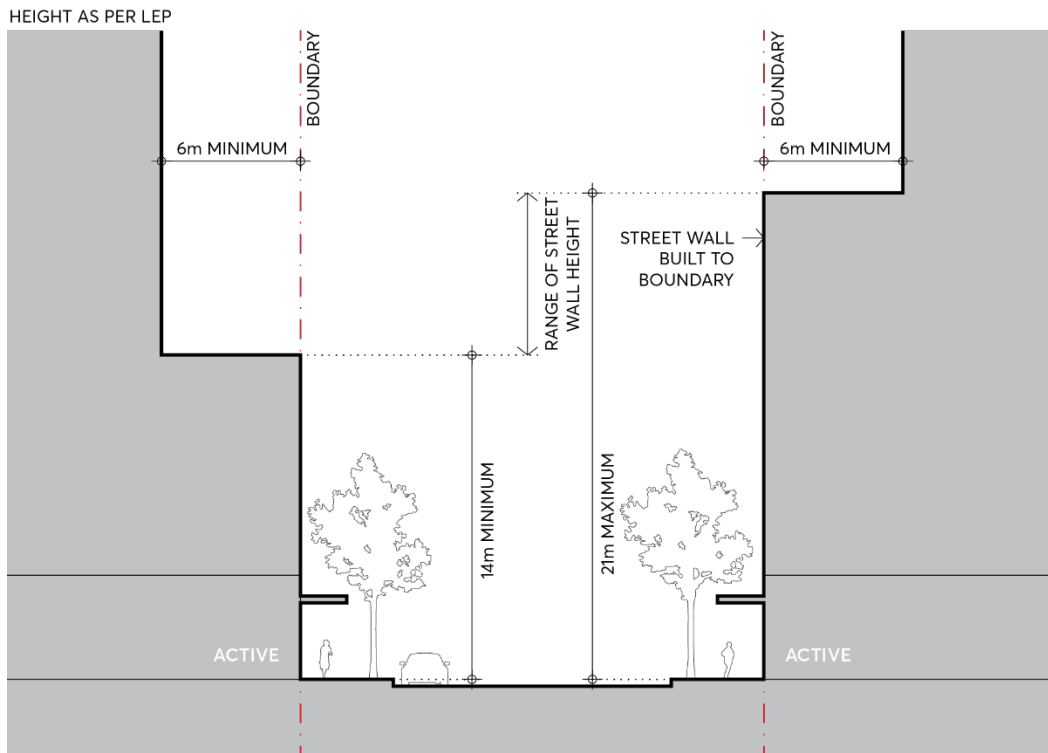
Street Setbacks and Street Wall Height – Active Ground Floor Street Frontage
